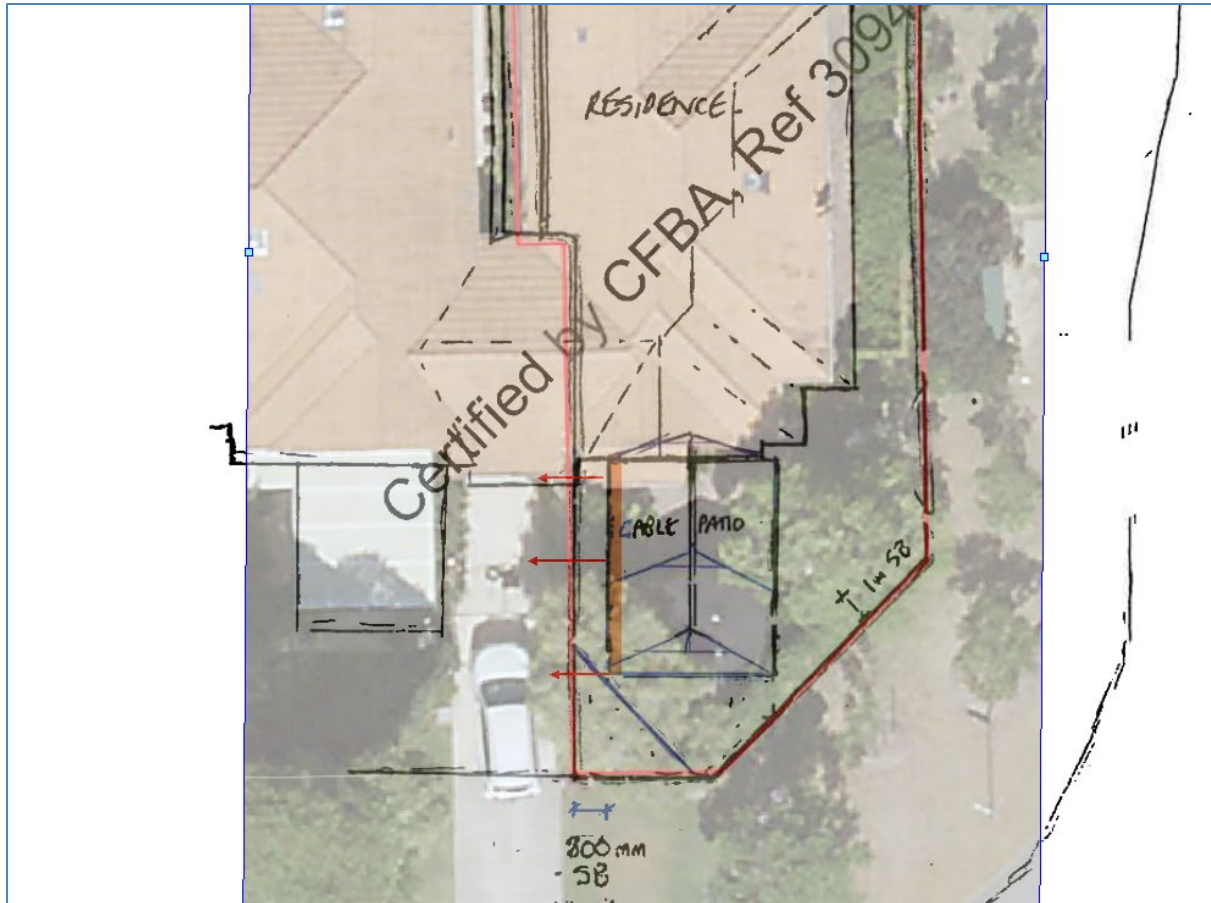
Aerial view of the proposed patio relative to the neighbouring property at 4/126-128 Waddell Road. Note the intervening driveway access.
